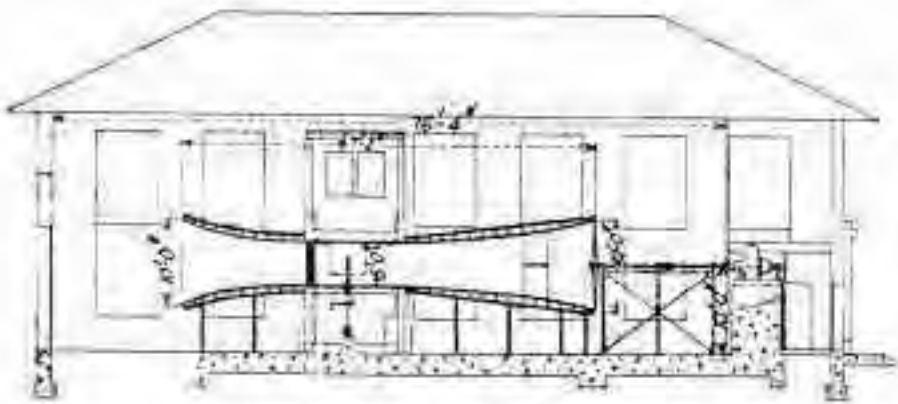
LONGITUDINAL SECTION OF THE WIND-TUNNEL BUILDING AND THE TUNNEL
